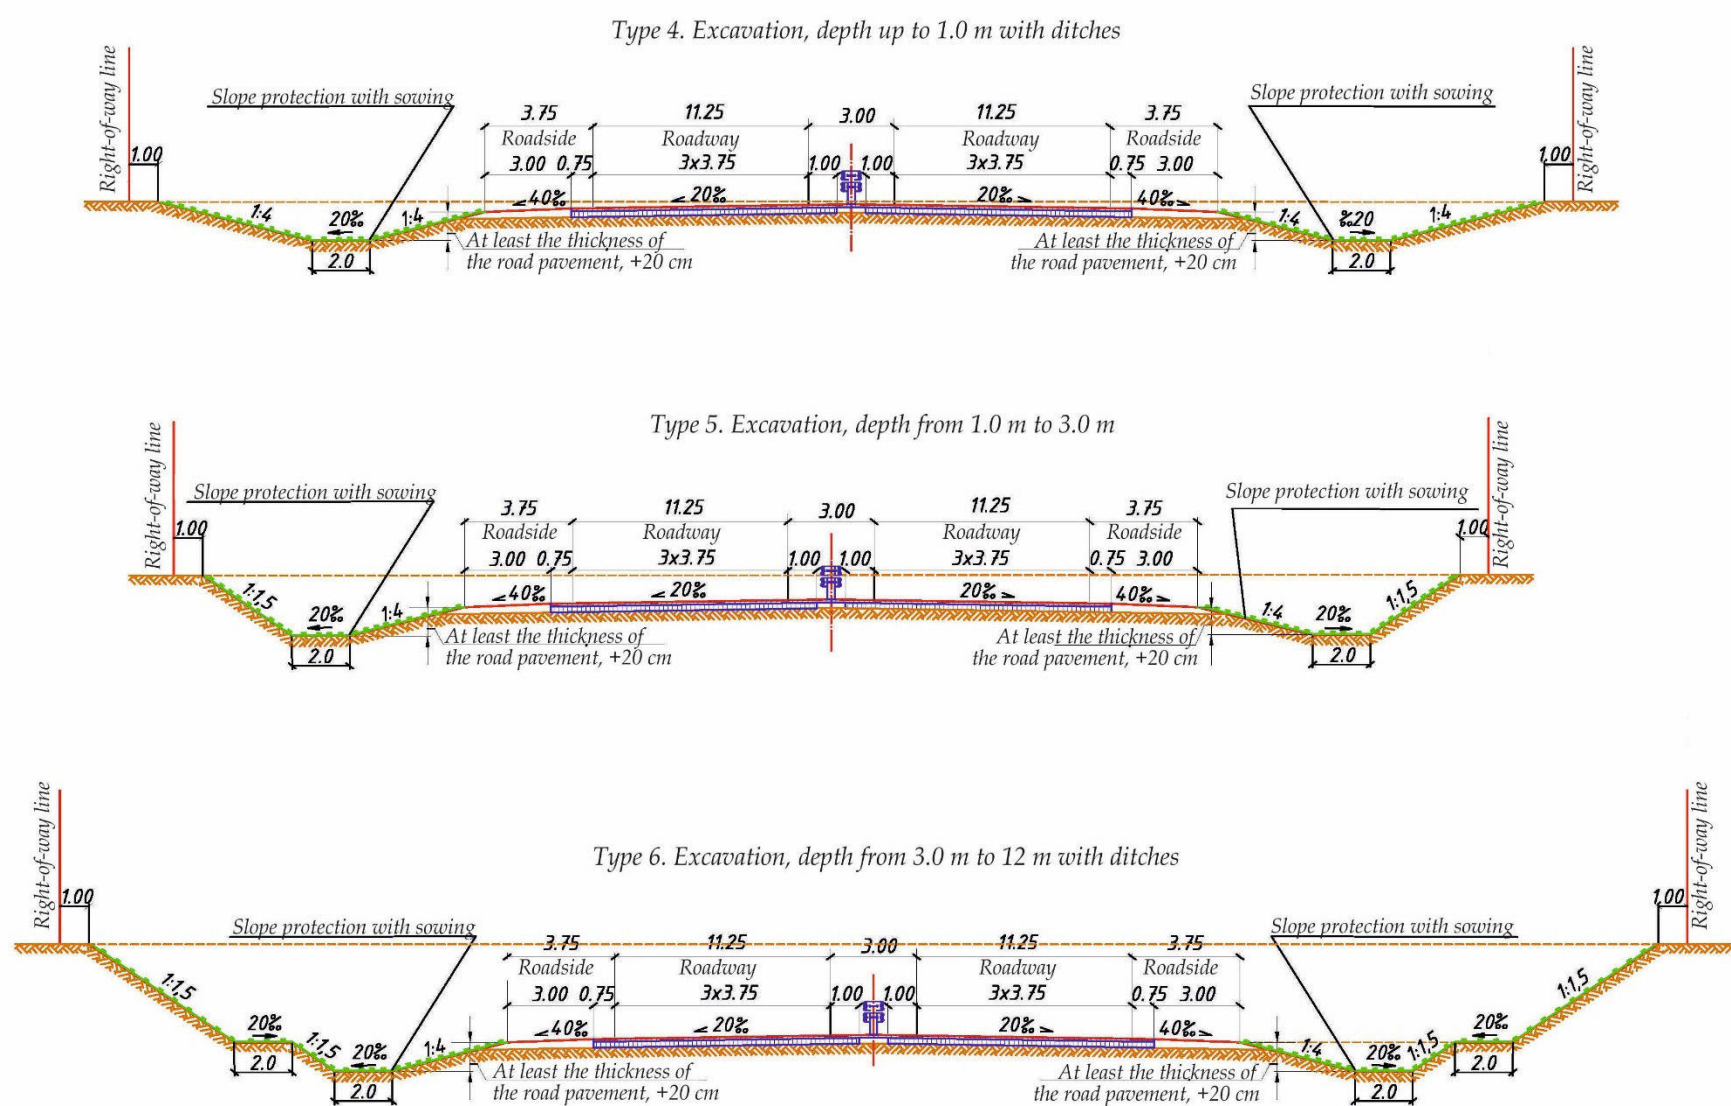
Road Profiles 4, 5, and 6 (for earth cuts)
